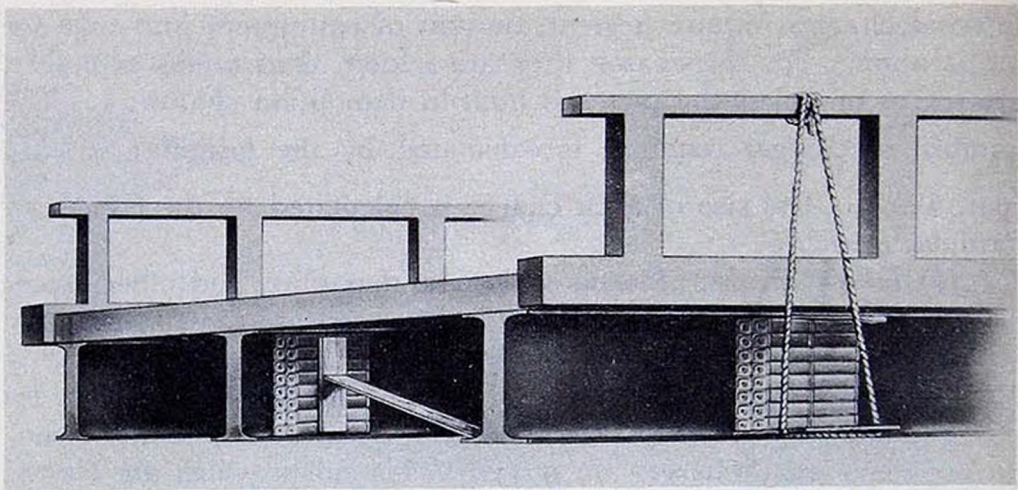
Placement of charges for demolition on a steel stringer bridge.
